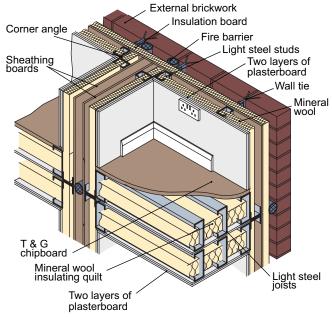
View of floor and wall in modular construction showing fire protection and cavity barriers
